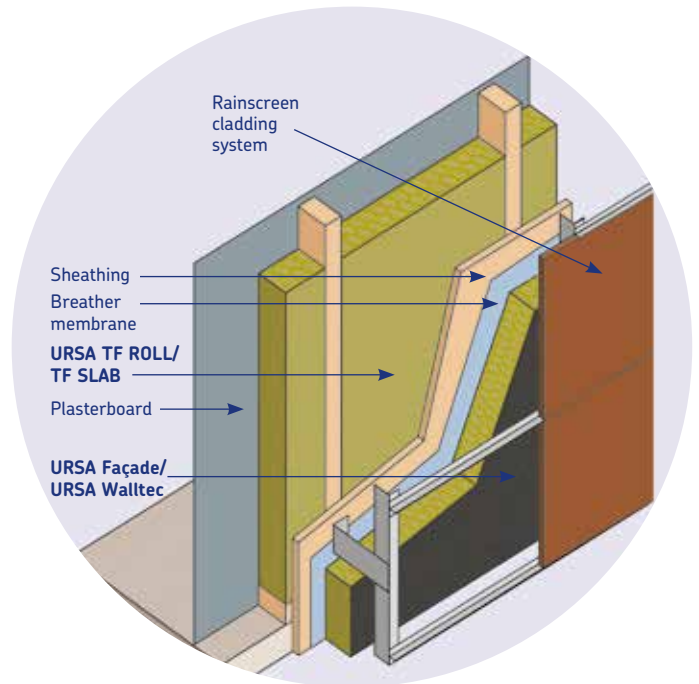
Rainscreen Cladding on Light Steel Frame Wall
